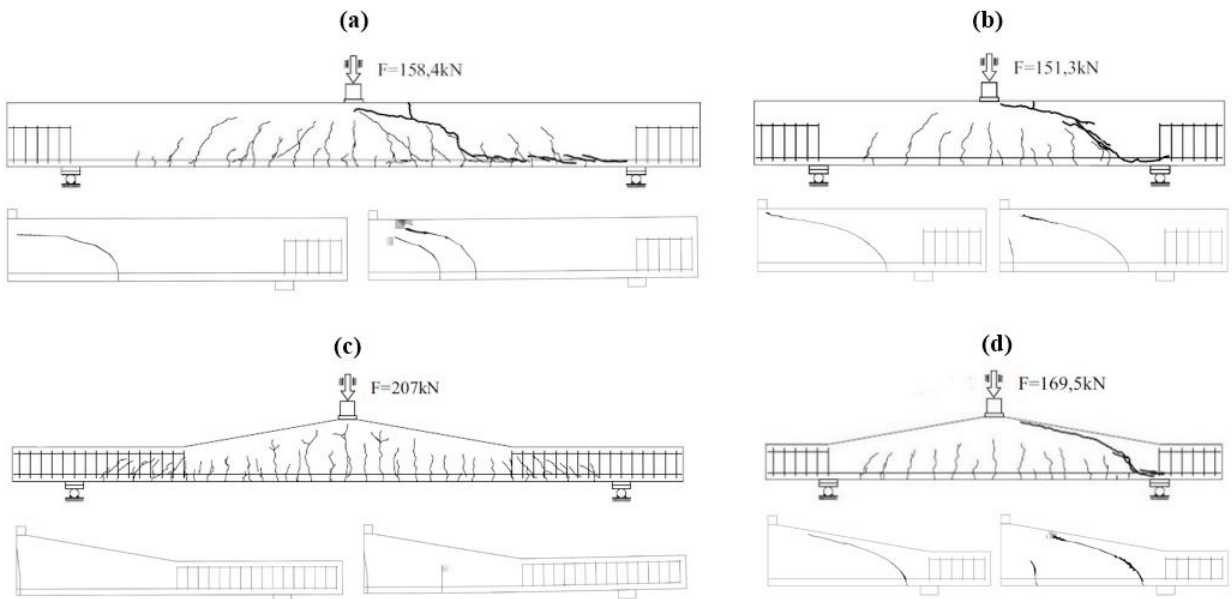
Comparison of crack propagation at failure with one and two crack-planes of test beams (a) 1L-2, (b) 1K-1, (c) 5L-2 and (d) 4K-1
